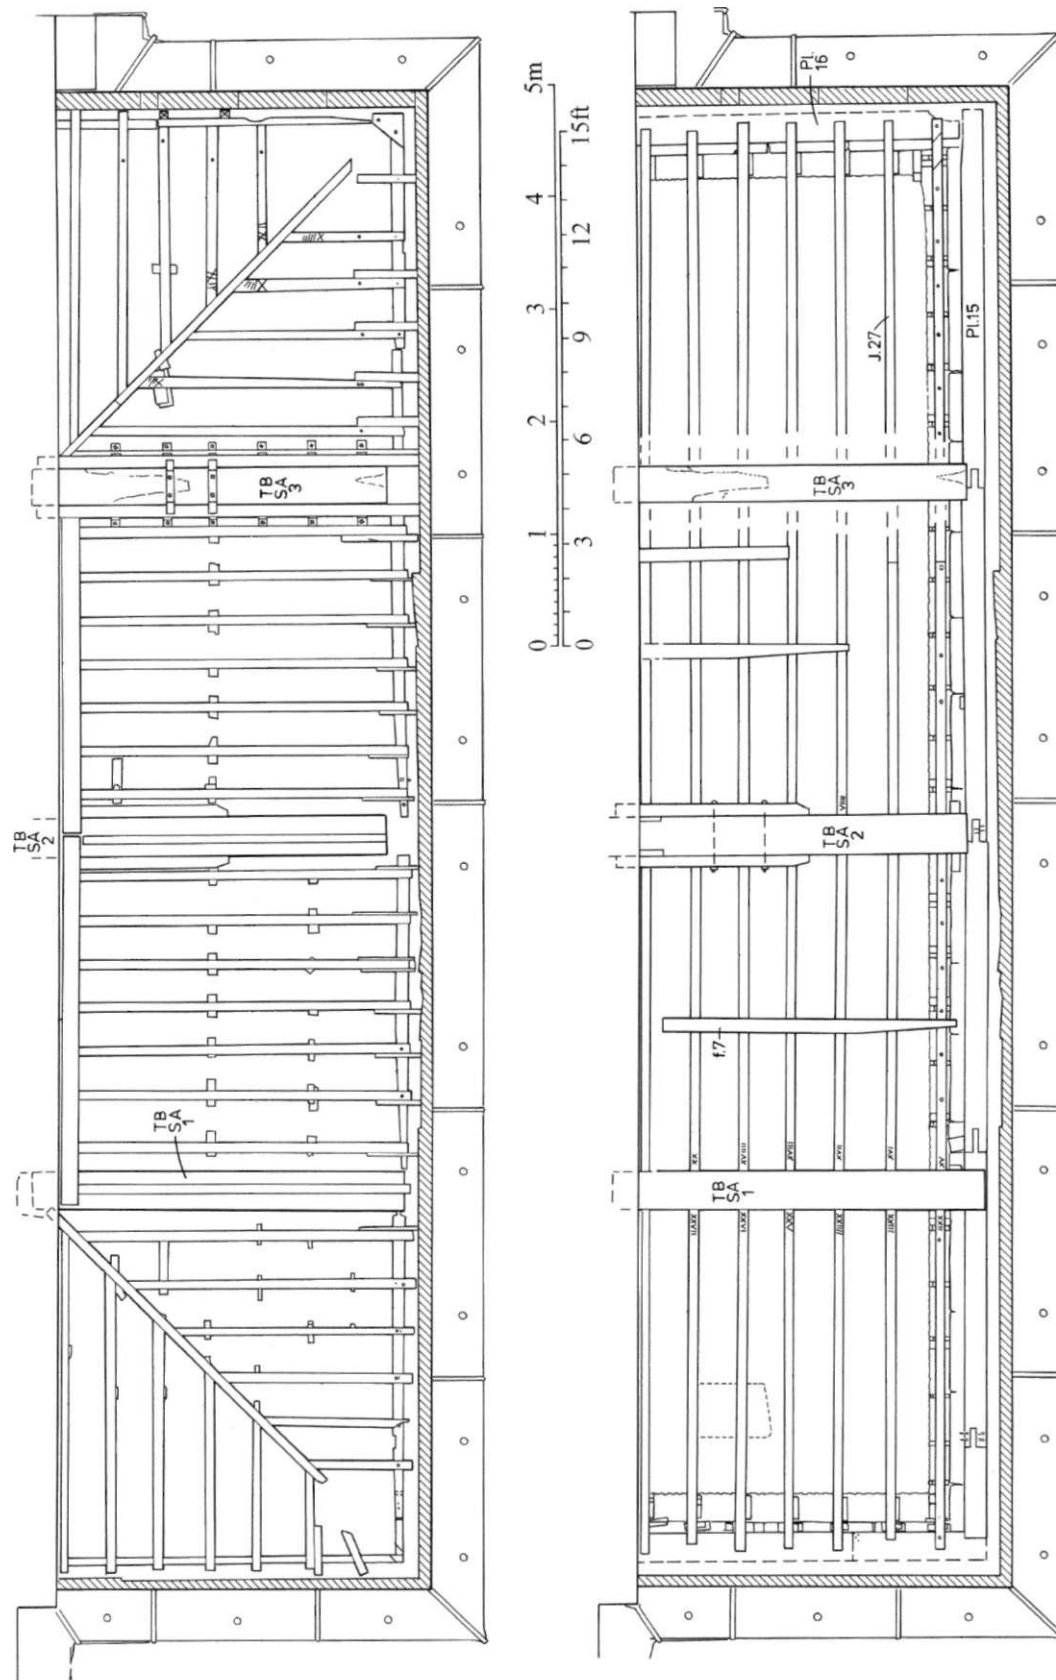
South aisle roof (*left*, rafters; *right*, ceiling joists)
